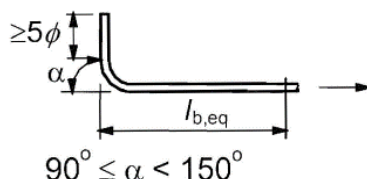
Geometric characteristics of the post-installed rebar. Source: EC2
